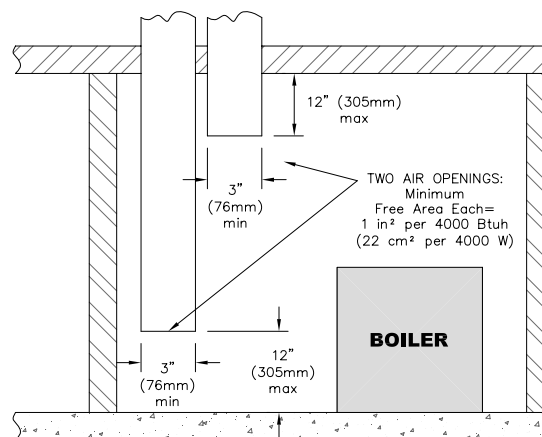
Air Openings – All Air from Outdoors through Vertical Ducts
